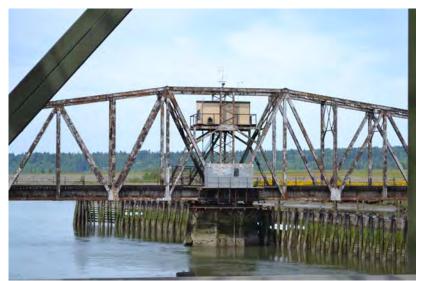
Detail view of the central swing span and control house looking west-northwest from the adjacent SR 529 southbound bridge over Steamboat Slough.
